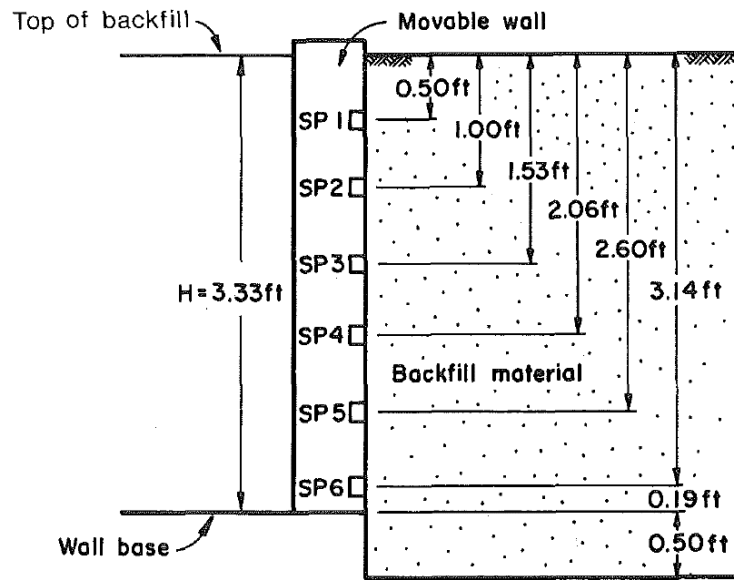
Locations of Pressure Transducers Behind the Wall
